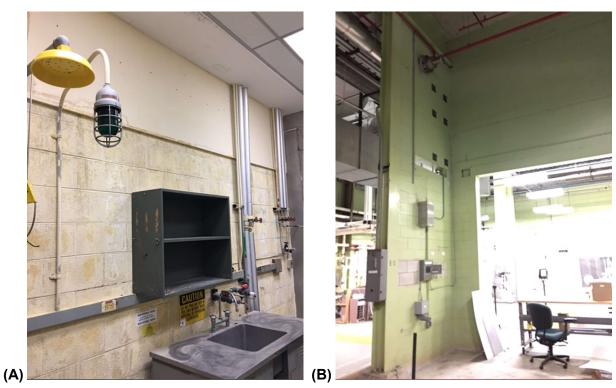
Photo images of the potential demonstration locations. (A) Building 7601 Basement, and (B) Building 7603 Basement1.
